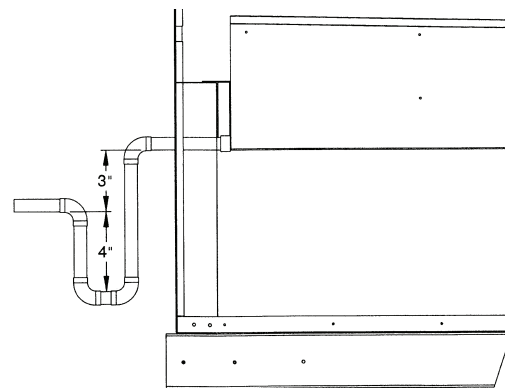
Condensate Drain Connections (Typical Roof Curb or Slab Mount Shown)
